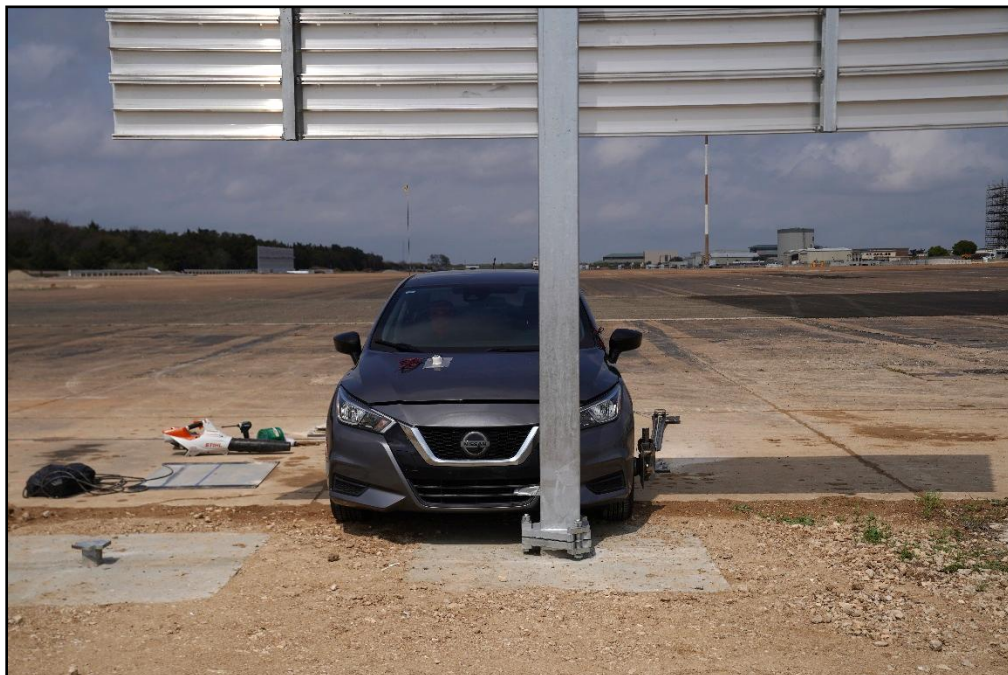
8 × 8 Square Tube Slip Base Sign Support System/Test Vehicle Impact Location 621201-01-3.
